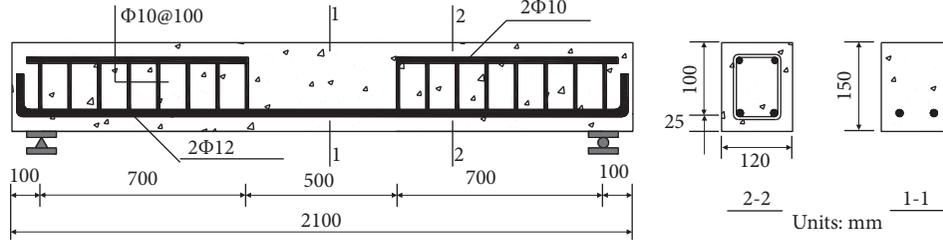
Design drawing of the dimensions of reinforced concrete beam.
